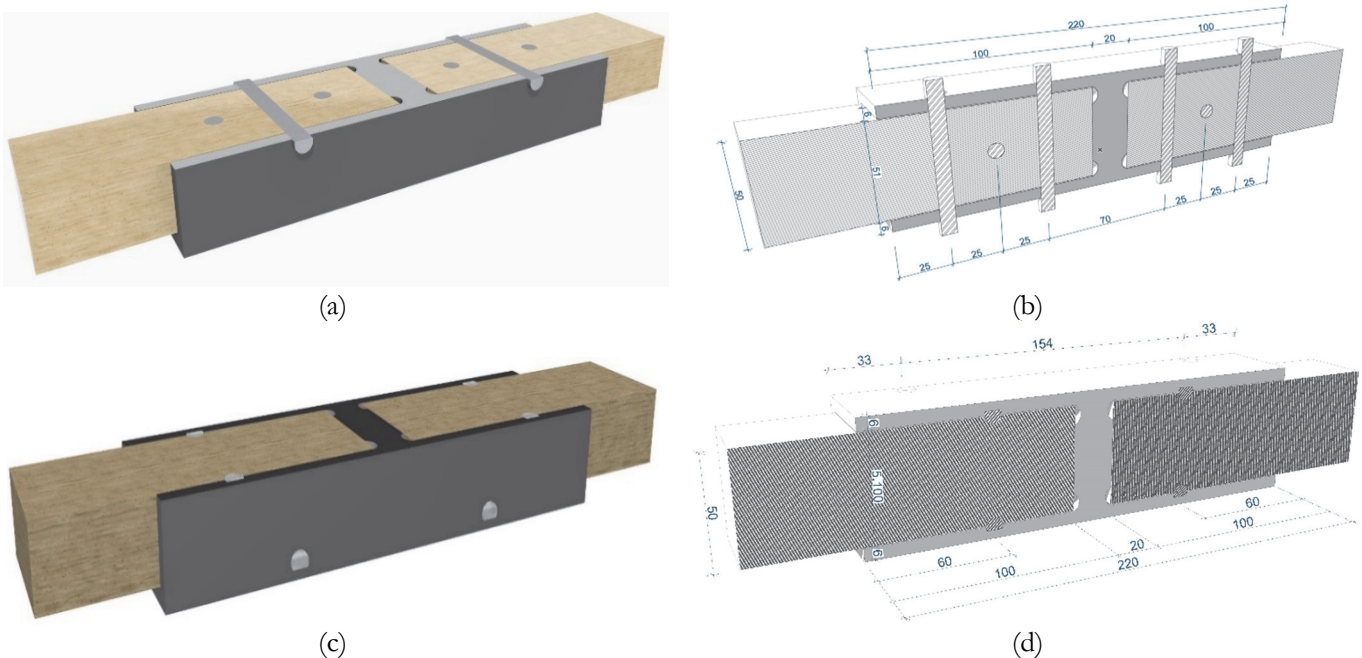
First (01) geometric variant of the 3D printed joint: (a) horizontal longitudinal cross-section, (b) dimensions [mm]. Second (02) geometric variant of the 3D printed joint: (c) horizontal longitudinal cross-section, (d) dimensions [mm].
